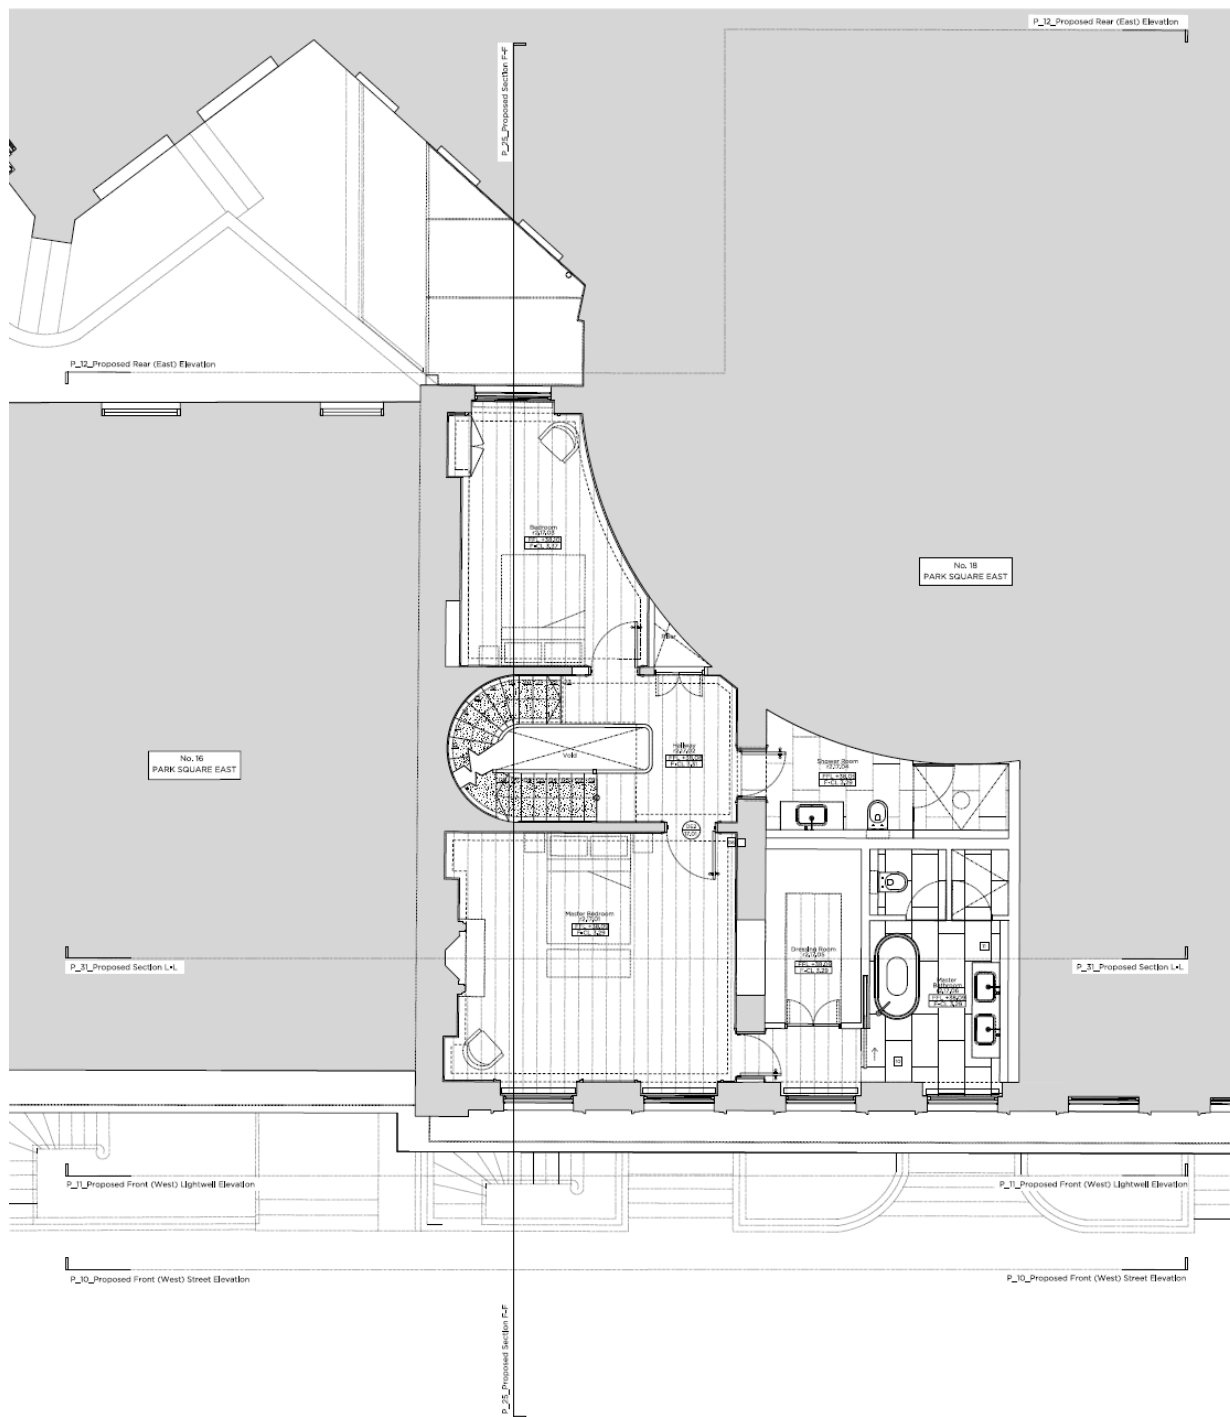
Proposed second floor plan, showing the incorporation of part of no. 18. MWA, February 2020.
